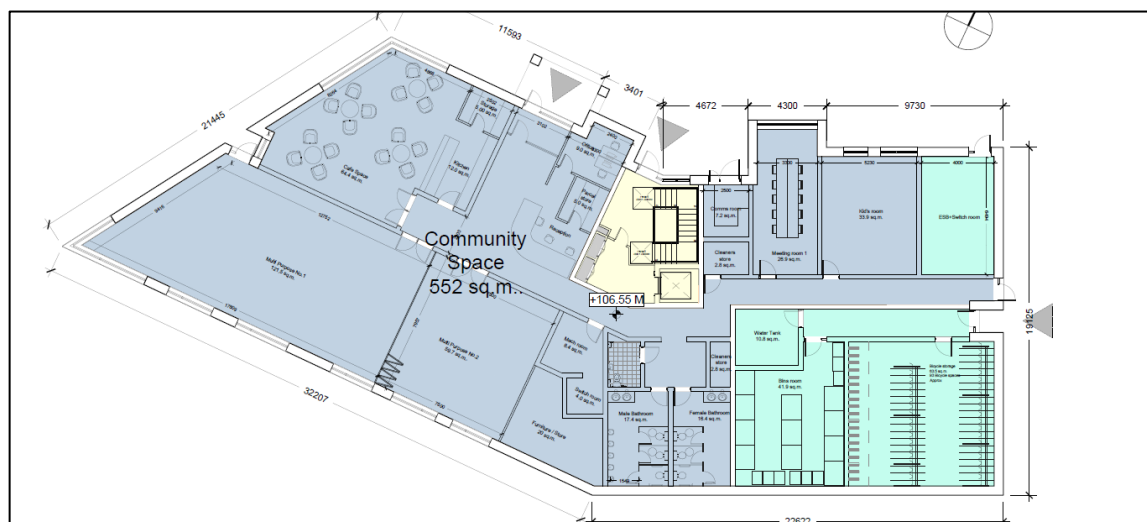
Block A Ground Floor Plan [Drawing no WPE-JFA-XX-AB-DR-A-P2001, prepared by JFA]
